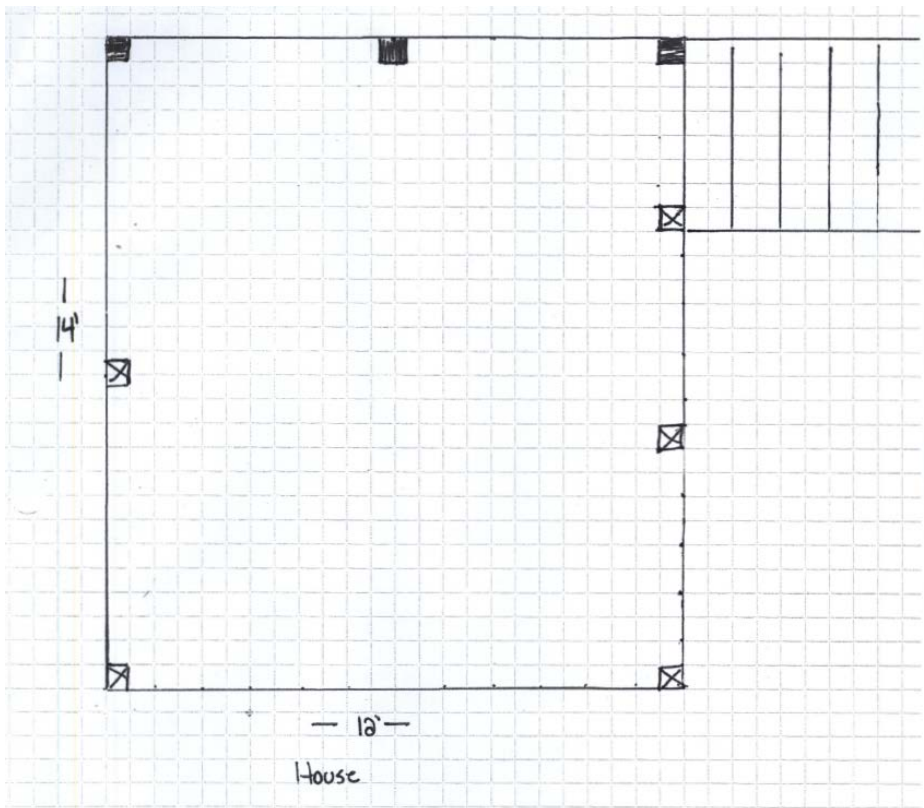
A plan showing the dimensions of the existing deck. The applicant is looking to replace the existing deck with a new deck within the same footprint.
